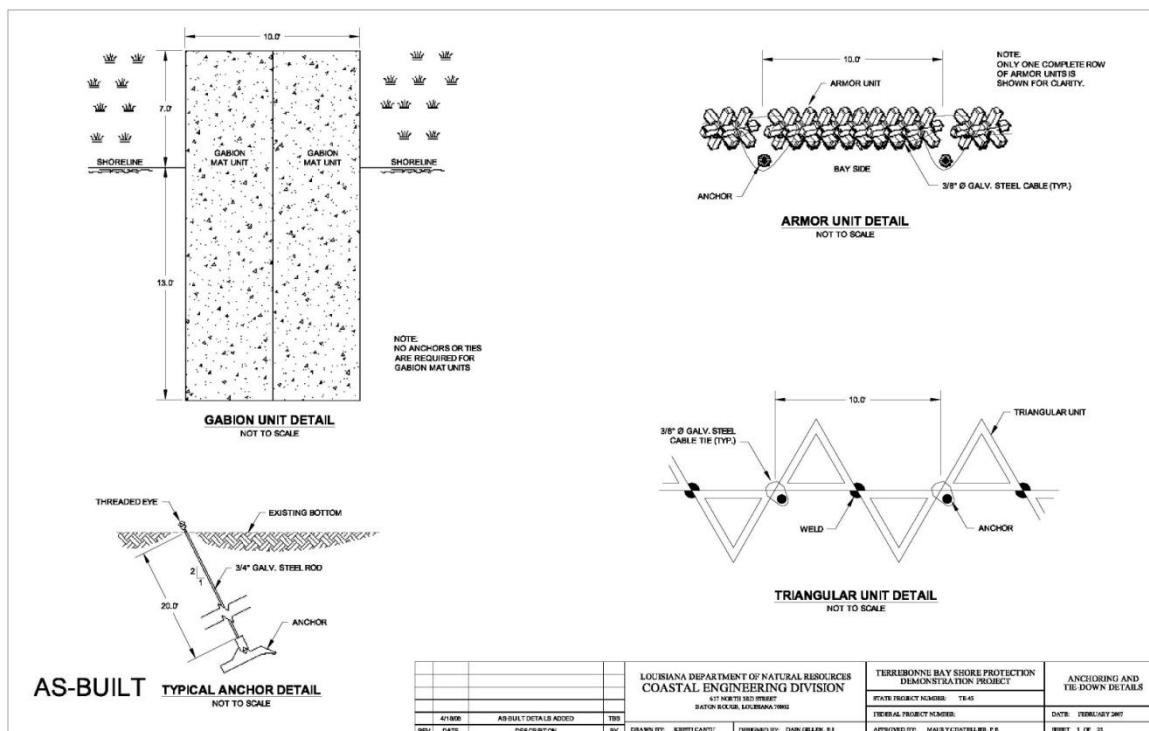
Aerial view depicting the typical layout and anchoring details for the Terrebonne Bay Shore Protection Demonstration (TE-45) project's Gabion Mat, A-Jack, and ReefBlk structures.
